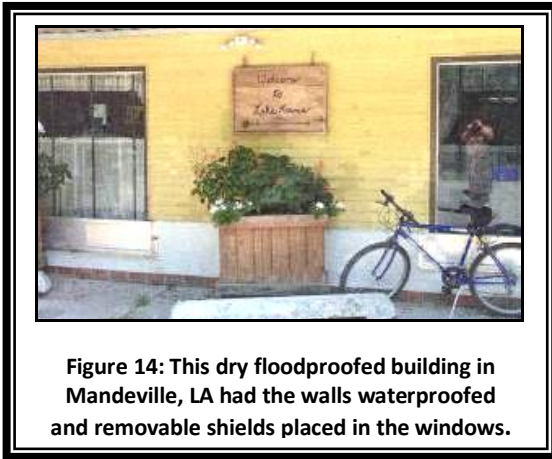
This dry floodproofed building in Mandeville, LA had the walls waterproofed and removable shields placed in the windows.
